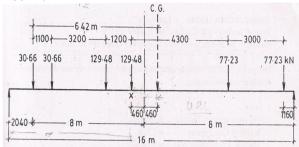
The wheel loads of I.R.C. Class a loading is arranged on the exterior girder A such that the heavier wheel load and the centre of gravity of the load system are equidistant from the centre of the girder.
